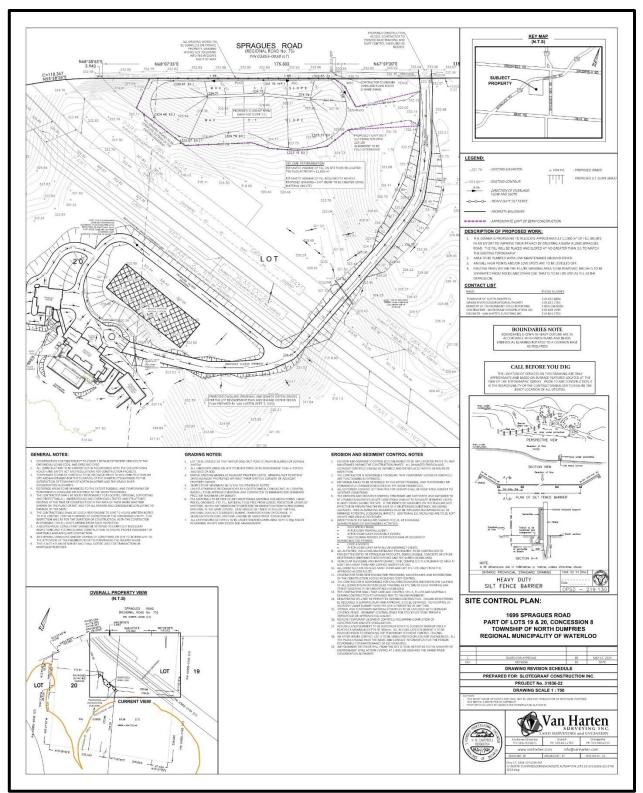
Proposed Site Plan (Provided by Slotegraaf Construction 2024)
